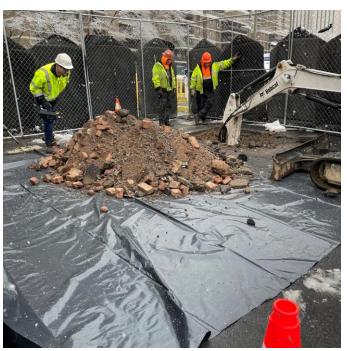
View of AARCO excavating test pit TP04 and stockpiling excavated soil/fill on polyethylene sheeting (facing north).
